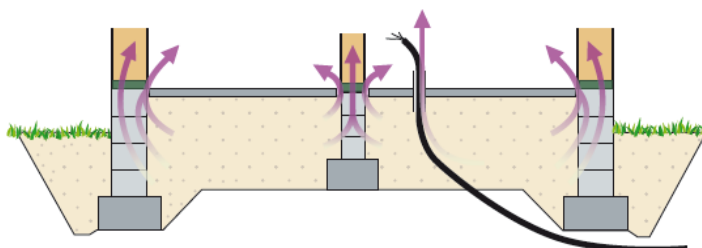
Entry routes of soil air in a Finnish slab-on-grade foundation. The foundation wall is of permeable light-weight concrete blocks (STUK 2008).
